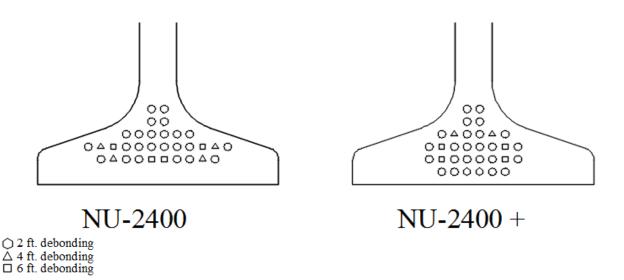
Straight Strand Pattern of NU-2400 Girders with 8-ft Spacing @ 140-ft Span Length
